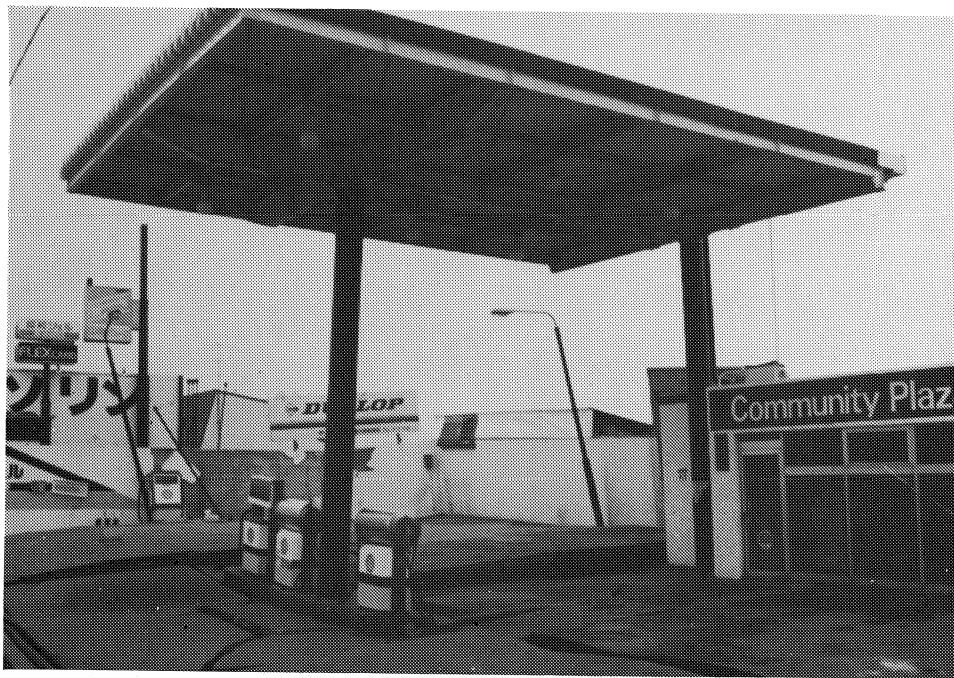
Substantial damage in Oshamanbe occurred to light buildings on shallow foundations due to liquefaction. This photo shows near-total damage to a gas station from liquefaction and settlement about 80 km from the edge of the aftershock area. Note how the tank(s) below are pushing up because of buoyancy. None of the glass is broken, indicating a low level of shaking. This is also a fill site on old farm land very near the shoreline. Much similar damage on poor soils was observed throughout the affected area.
